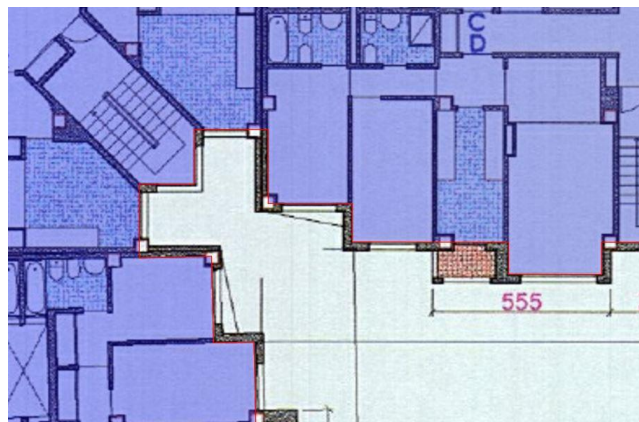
Detail of the criteria used to obtain the surface area of the building.
